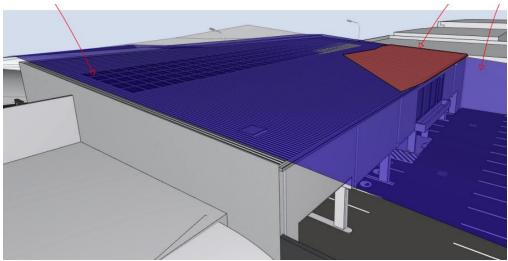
3D image showing the breach to the building height in red (source: Centric Architects)
